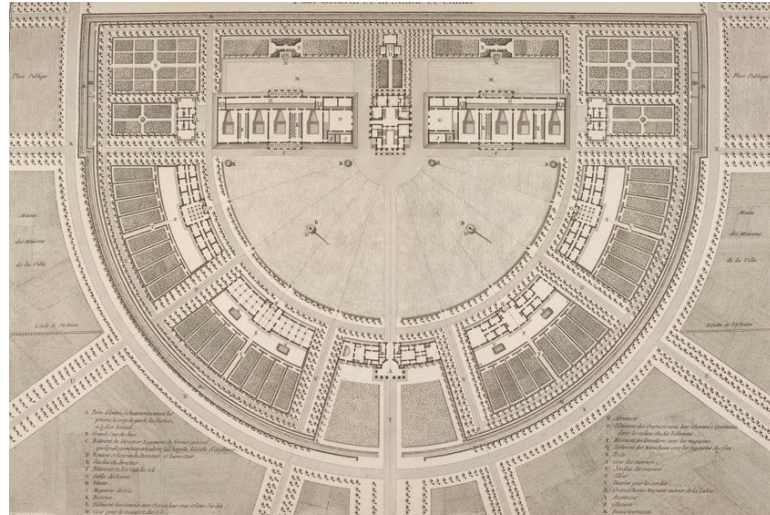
Plan of the Royal Salt works at Arc-et-Senans (Source: web.4)
